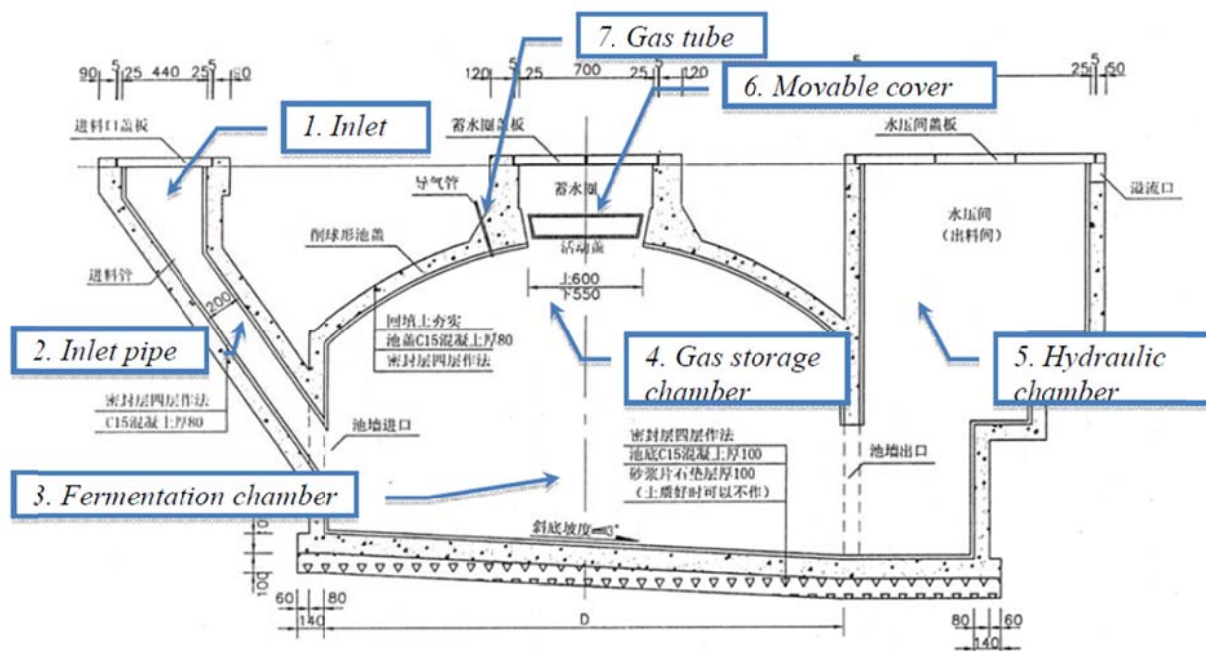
Typical design of a household biogas digester installed under the proposed PoA.
